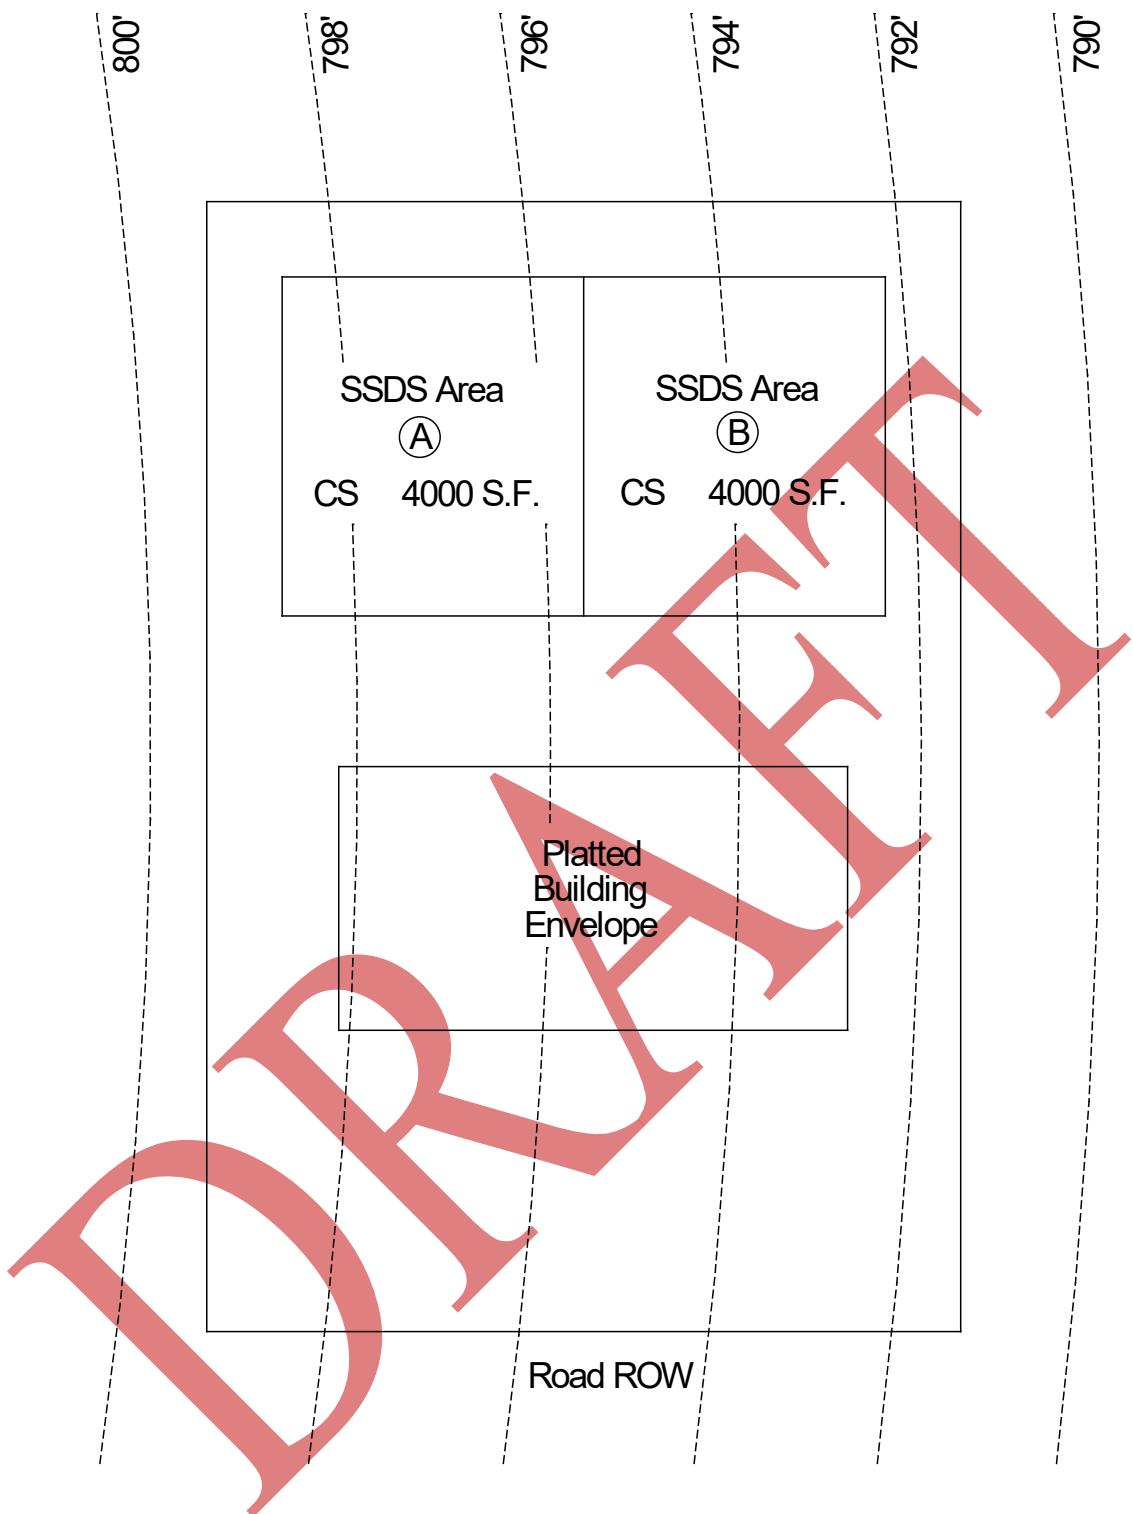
Example of an area layout that has been configured so as to allow for a more efficient conventional subsurface sewage disposal system layout and installation.
